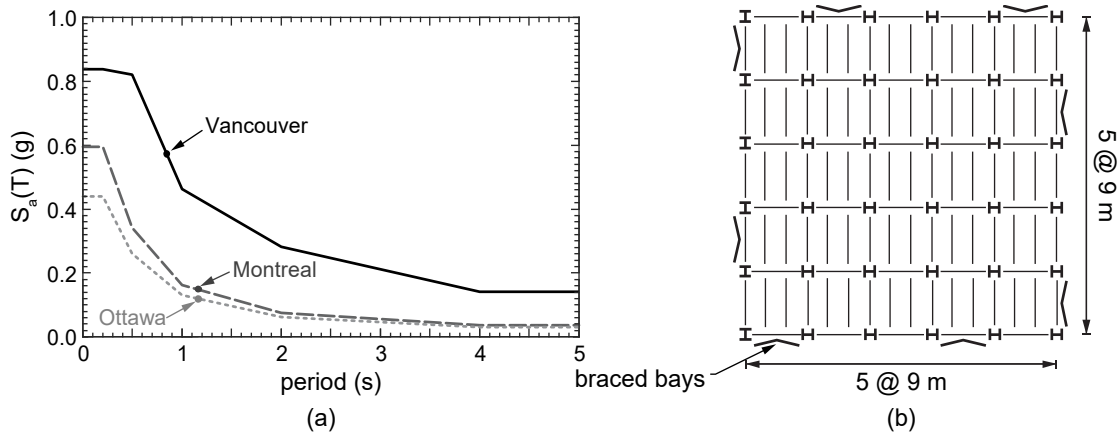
(a) NBCC 2015 elastic design spectra and (b) prototype building floor plan.
